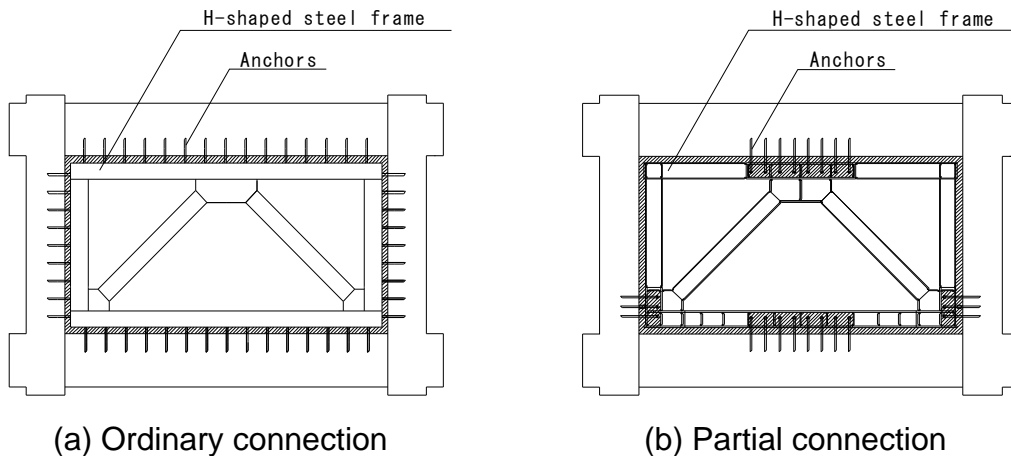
Reinforced concrete frames retrofitted by framed steel brace system
